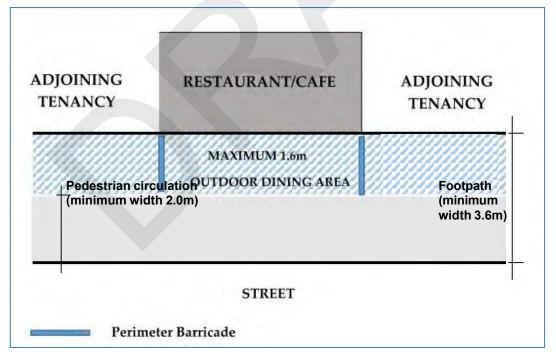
Dimensions for outdoor dining for all other locations with or without parking adjoining
